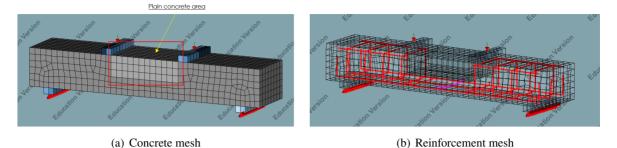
Three-dimensional FE model of the corroded beams without stirrups in the flexural span
